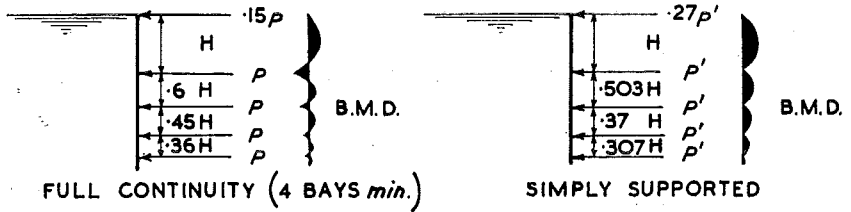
CALCULATED MAXIMUM SPACING OF WALINGS VERTICALLY BELOW HIGH-WATER LEVEL, BASED ON THE STRENGTH OF THE SHEET PILING.
